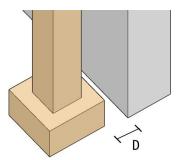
Schematic diagram of the setback between the new and old structures Source: Author's own drawing
